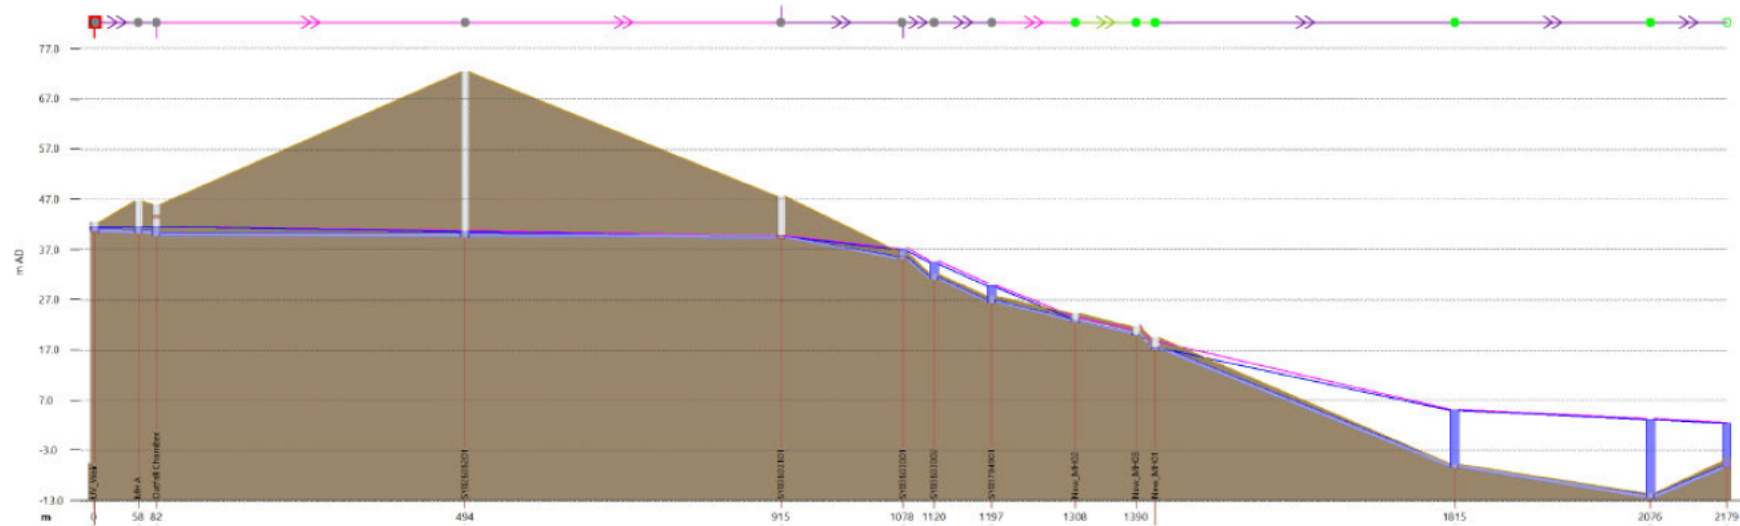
Proposed Outfall Long Section showing sufficient capacity at 991 l/s
